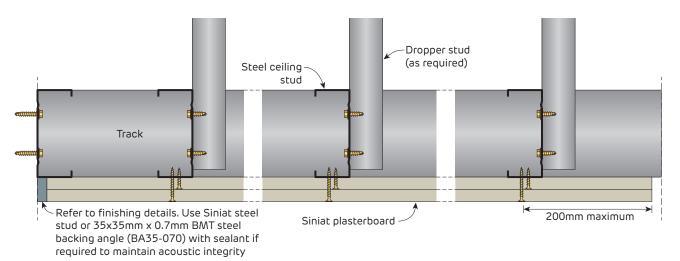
Stud Ceiling Type C1 - 2-way Plenum Braced
